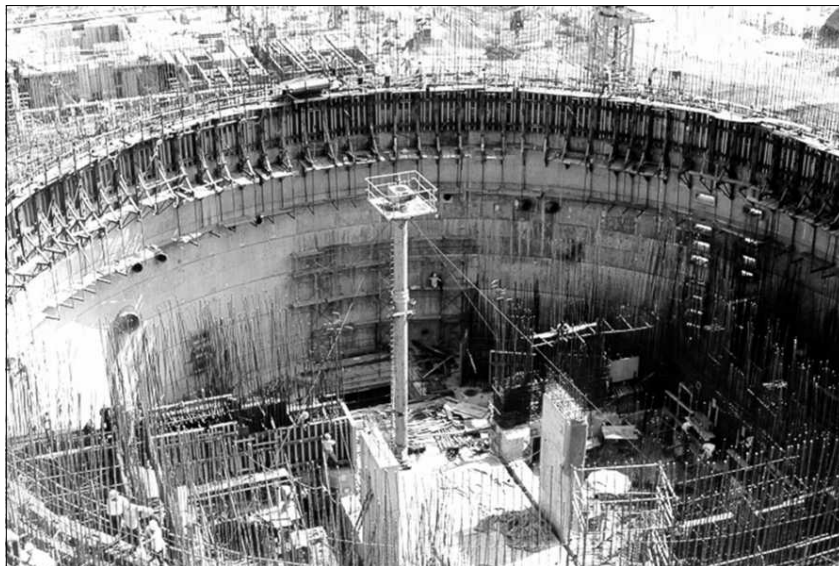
Work on the Container Shell in Progress at Kaiga. Project Executed by L&T Limited, ECC - Construction Group.
